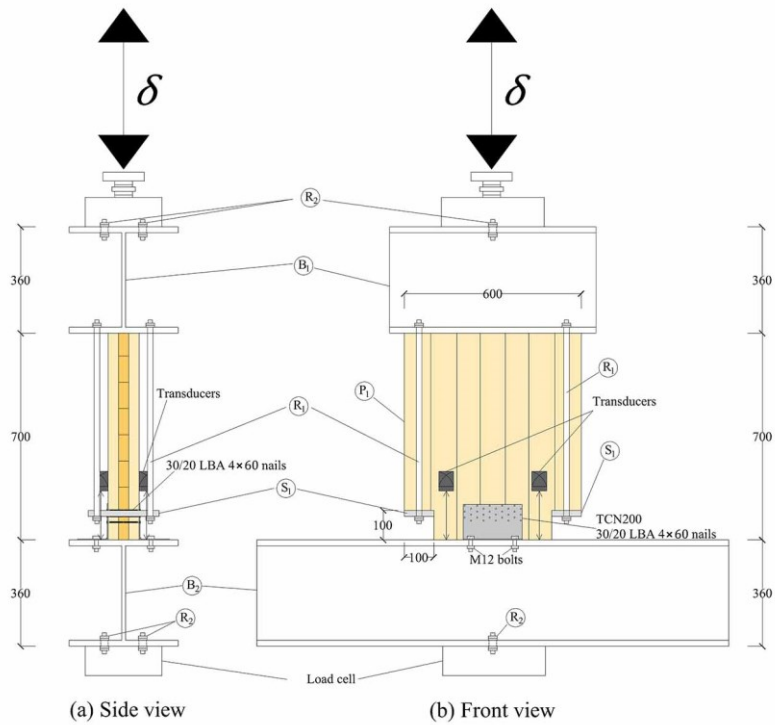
Test set-up of TCN200 angle bracket connection subjected to uplift
